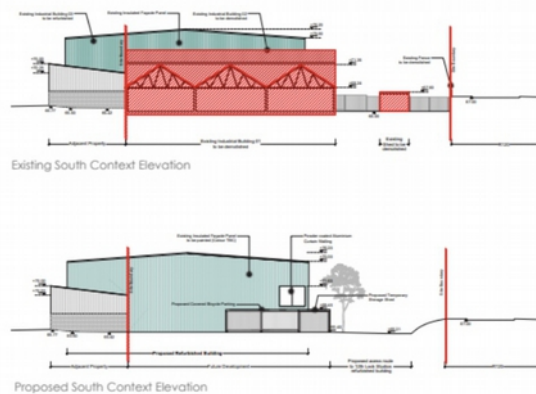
Existing and proposed south elevations. Existing site buildings hatched in red to be removed. Source: Stephen Foley Architects
